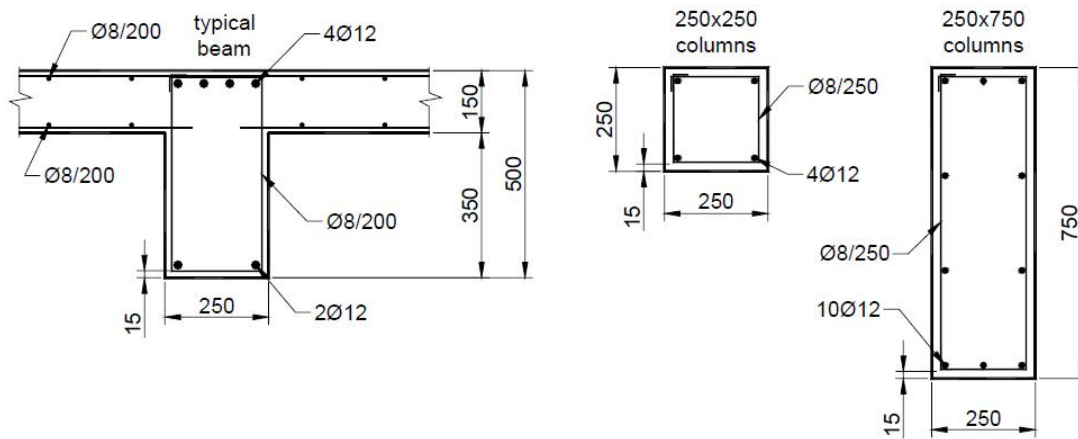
Cross section properties of SPEAR (units are in mm) [77].
